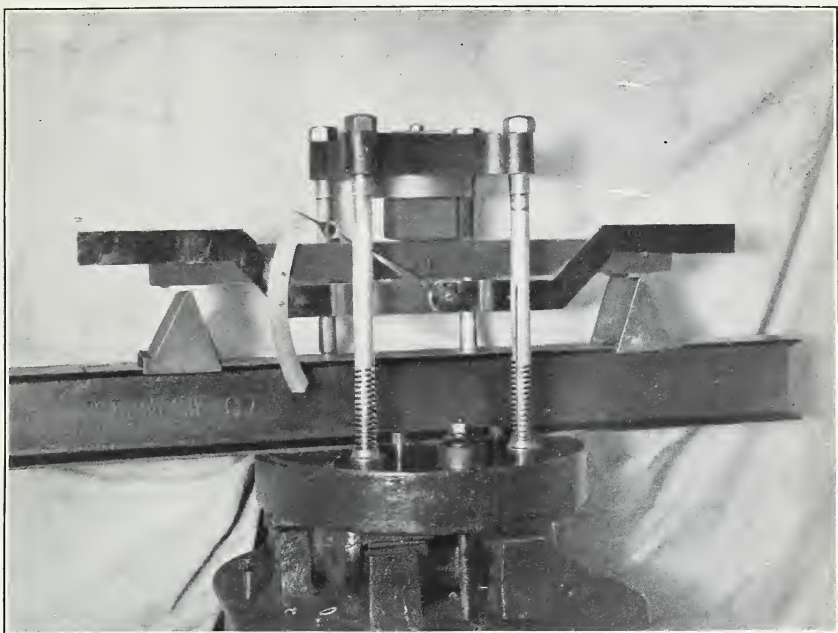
MACHINE AND METHOD USED FOR TESTING SMALL BEAMS.
